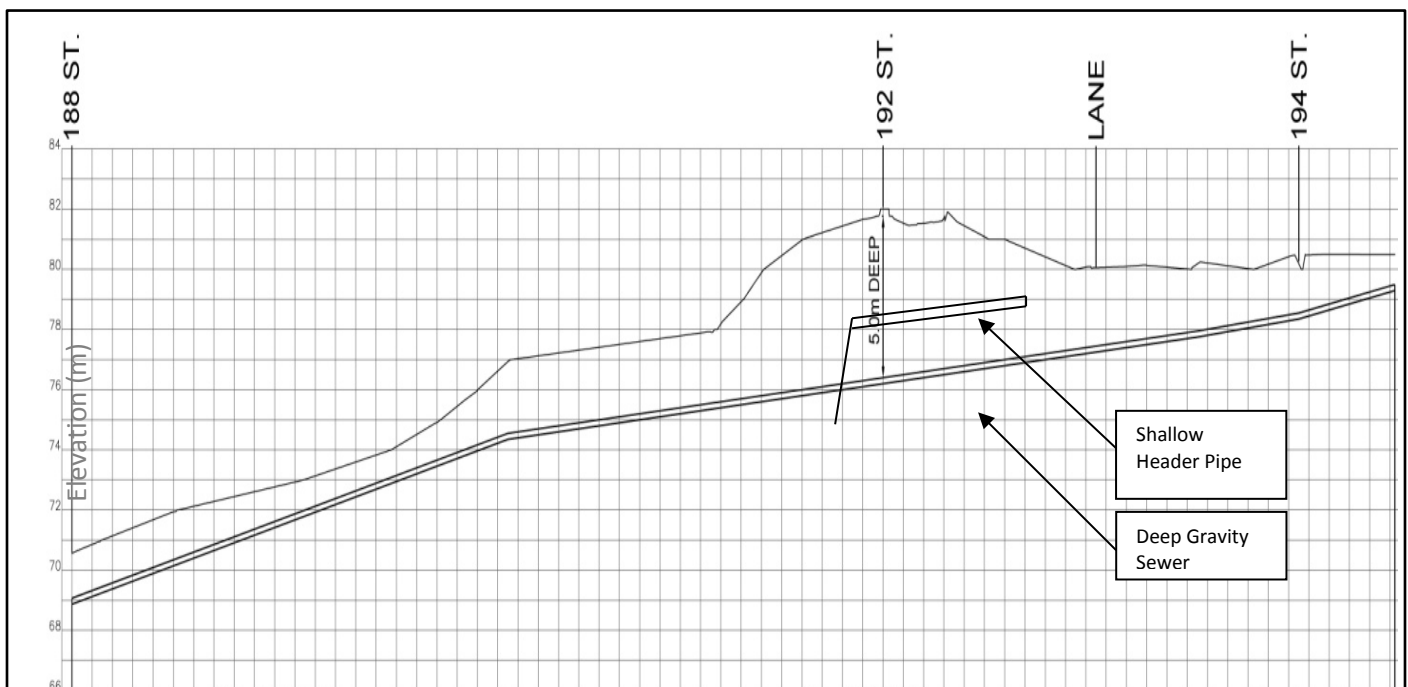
Storm Sewer Profile East of 188 Street at 74 Avenue
